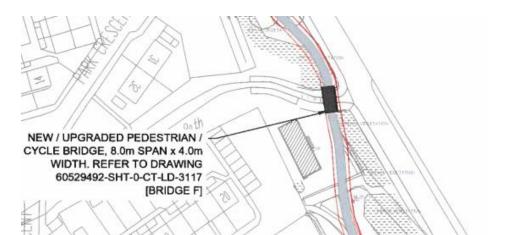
Proposed upgraded existing pedestrian and cycle bridge, 4m wide. (known as Bridge F). Drawing 70.
